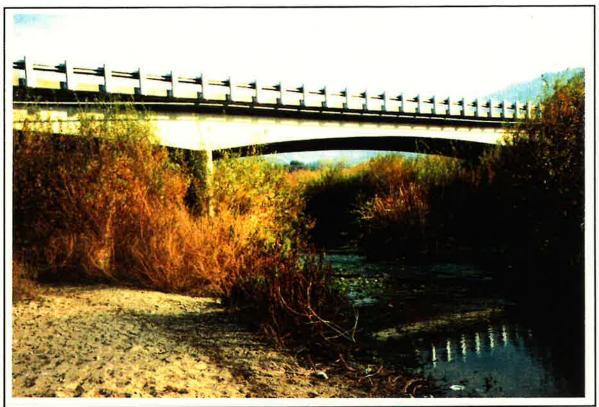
Malibu Canyon Road Bridge Looking Downstream
